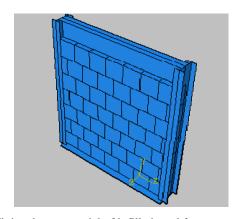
schematic view of test specimen and Finite element model of infilled steel frame
